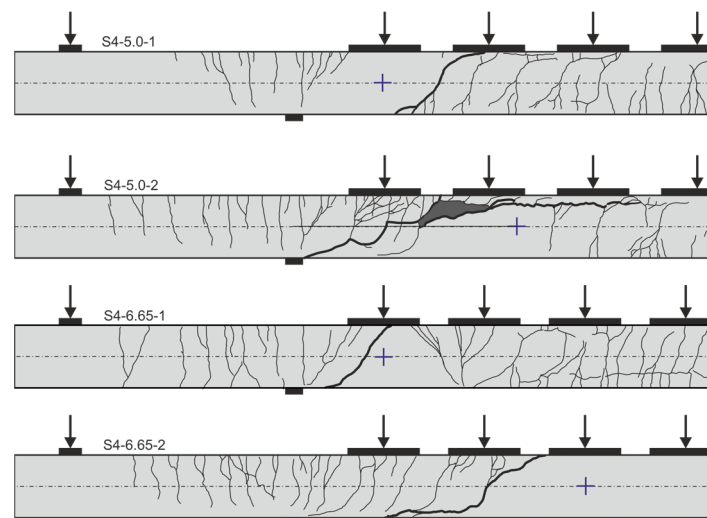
Crack patterns of simply supported members with cantilever (intermediate support) and distributed loading (S4).
